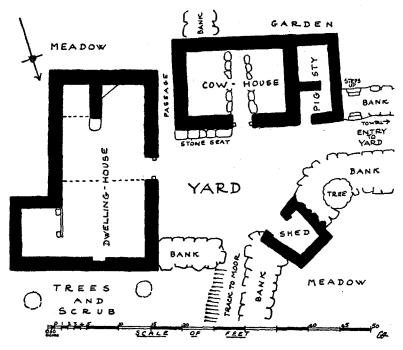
CARN-DEIFOG-ISAF: sketch plan of the Steading
